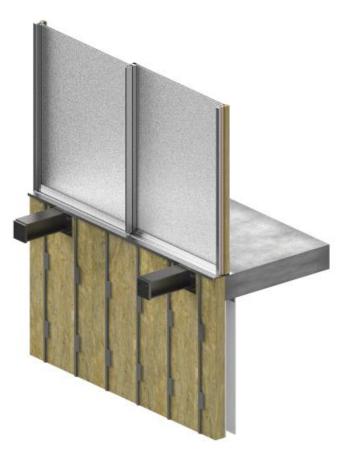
Representation of Detail 2, Sapphire anchor at sliding glass door
